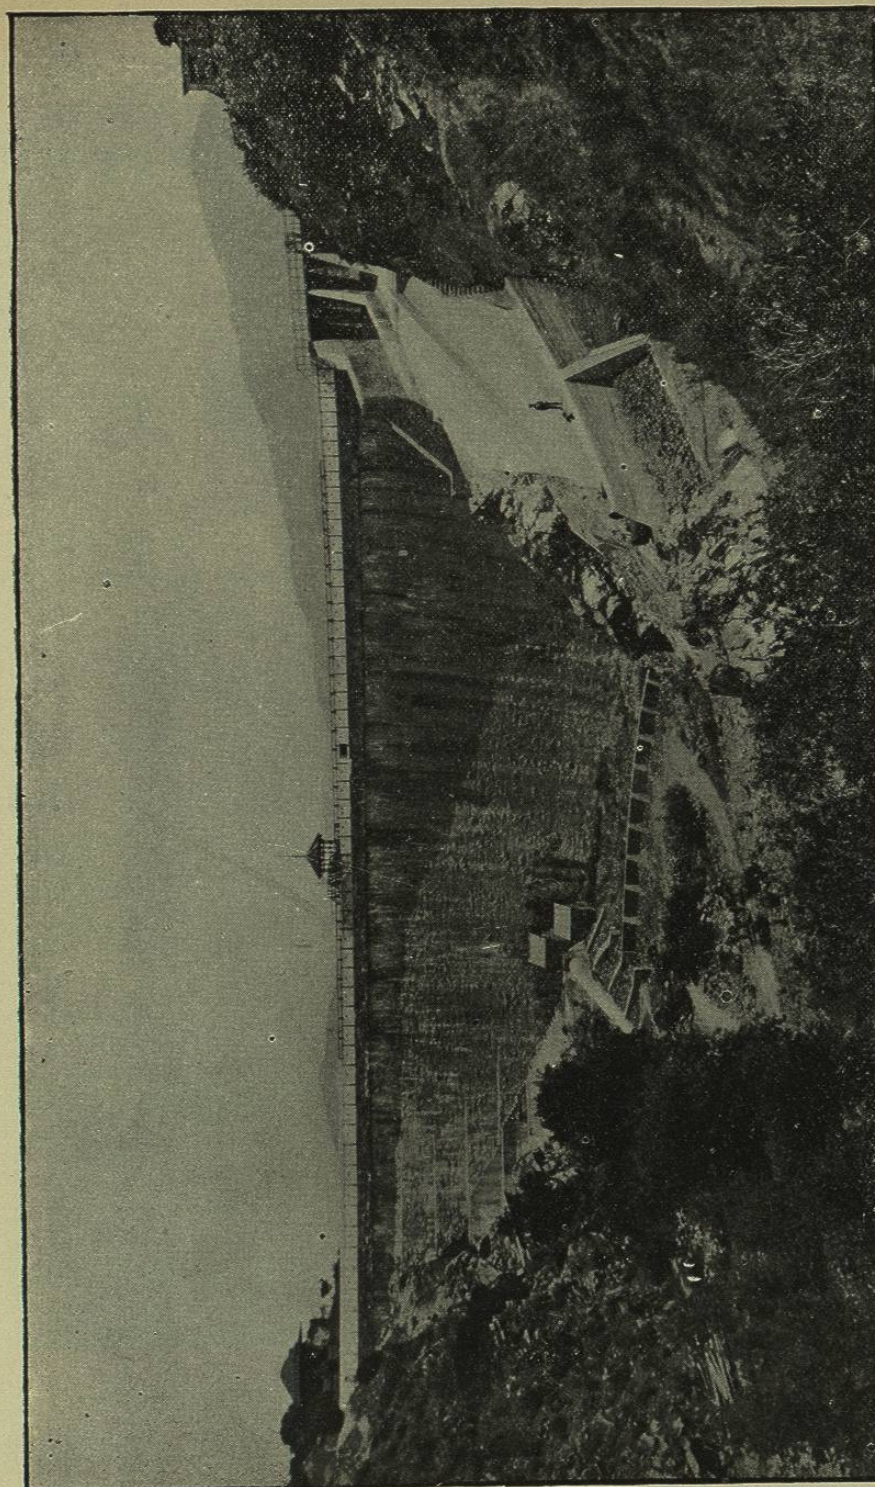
SWEETWATER DAM, SHOWING NEW APRON OF SPILLWAY AND PROTECTING SPIR-WALLS ON PIPE-LINE.
